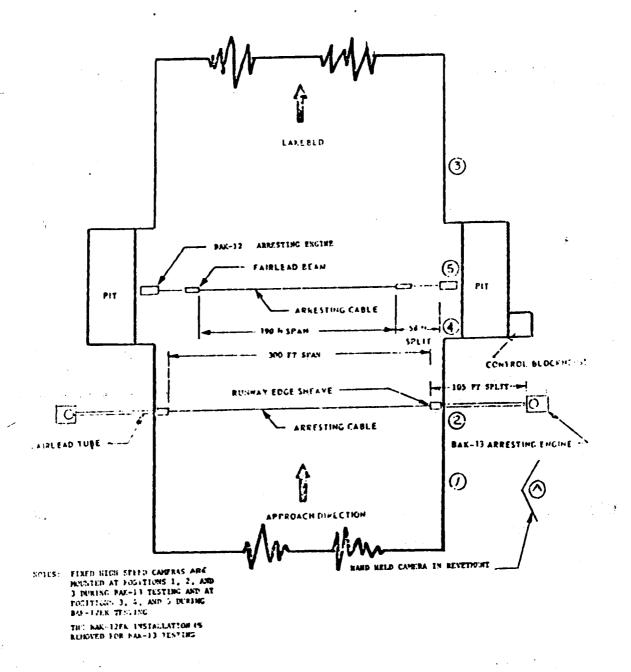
BAK-12 and BAK-13 Arresting System Installations
